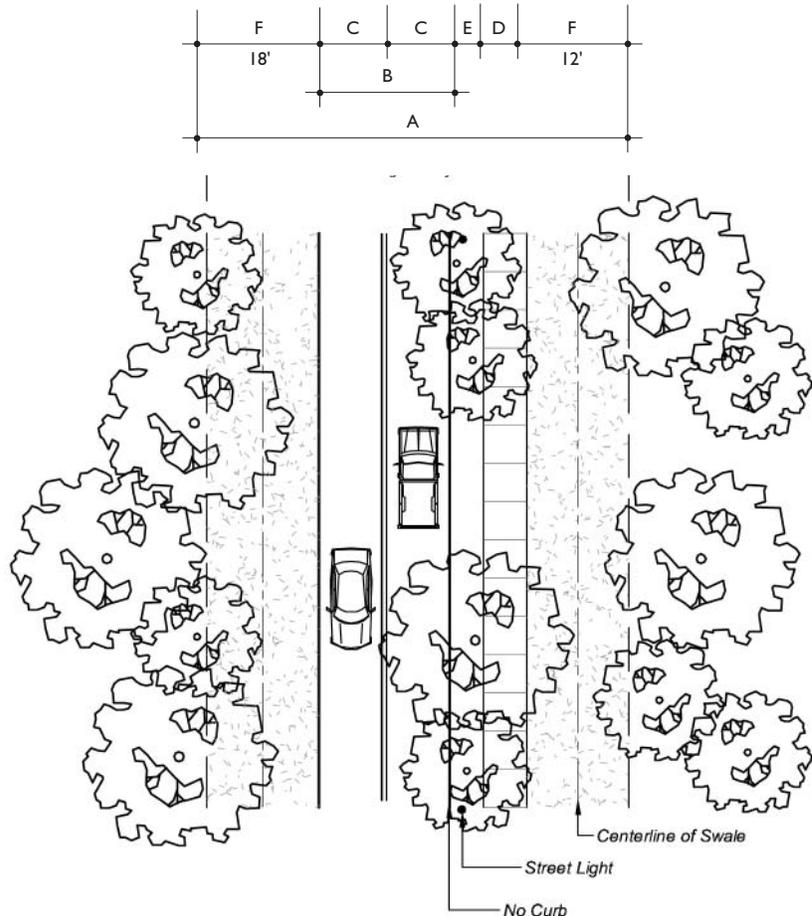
Typical 70-Foot Preserve Drive (PD-70) Section
